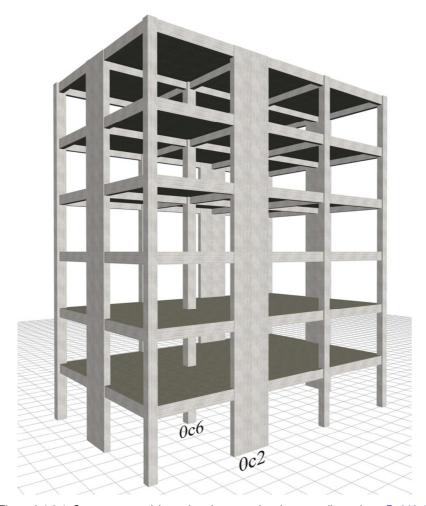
Structure comprising only columns and perimeter walls, project <B\_642-1>
